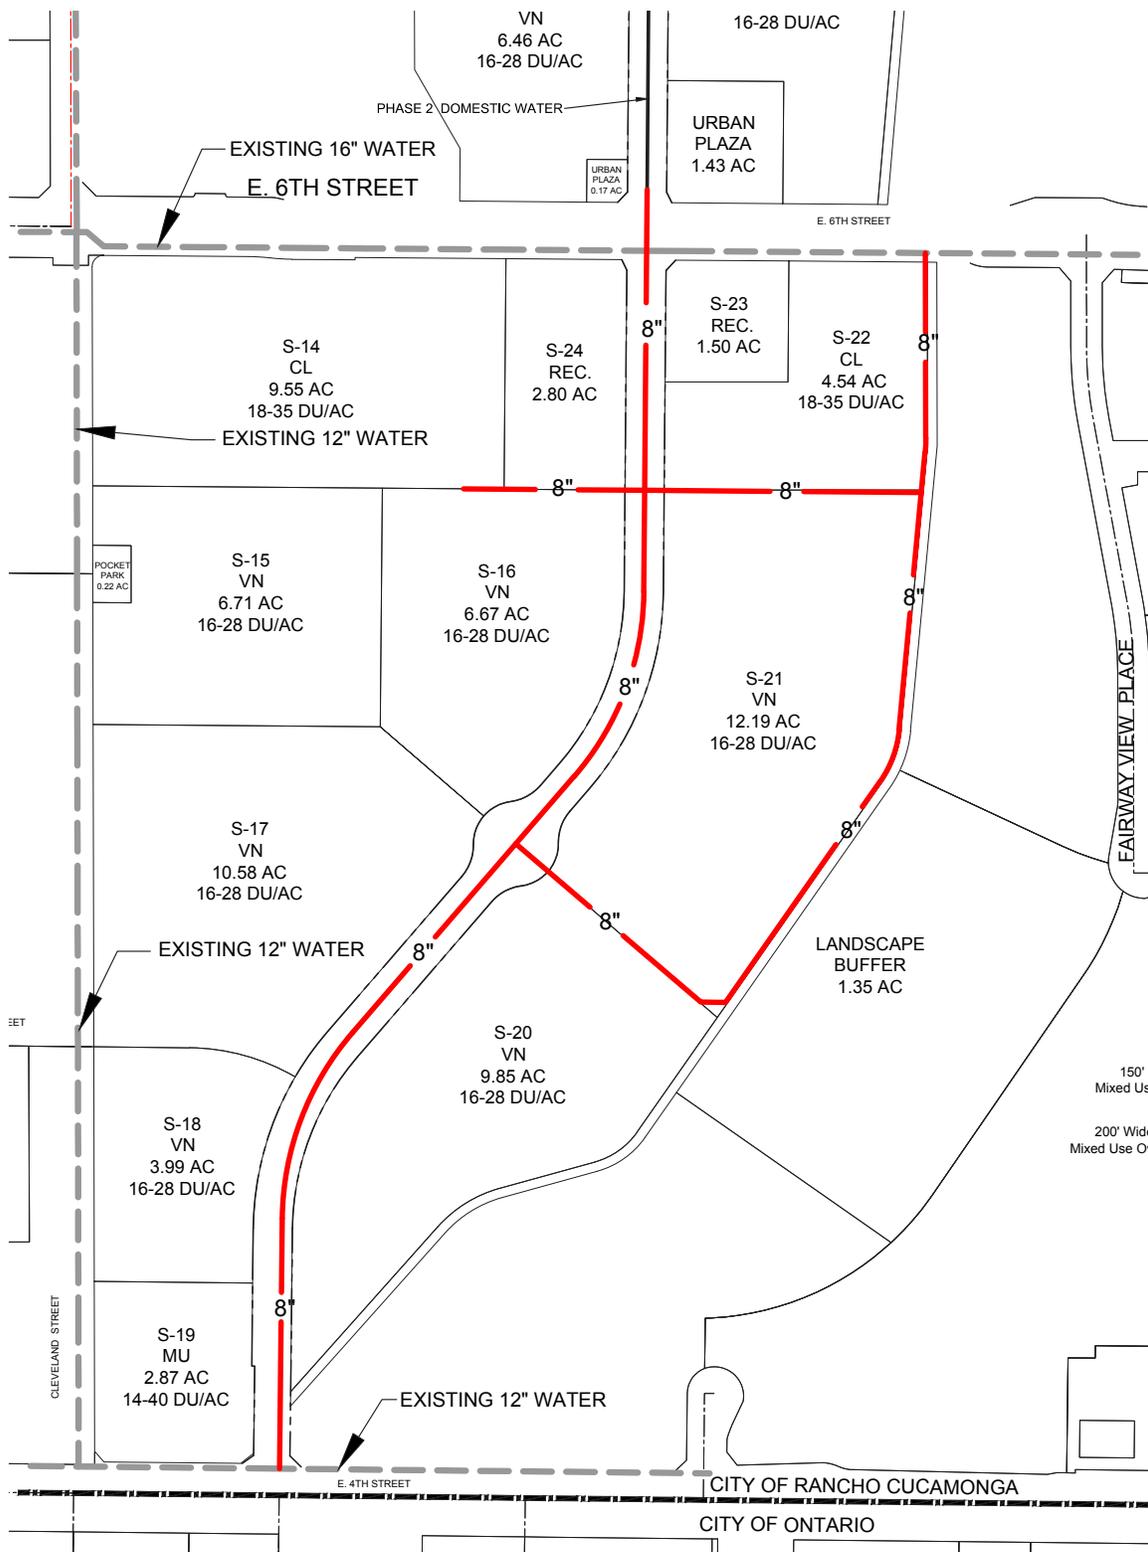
Conceptual Phase 1 Domestic Water Facilities Plan
